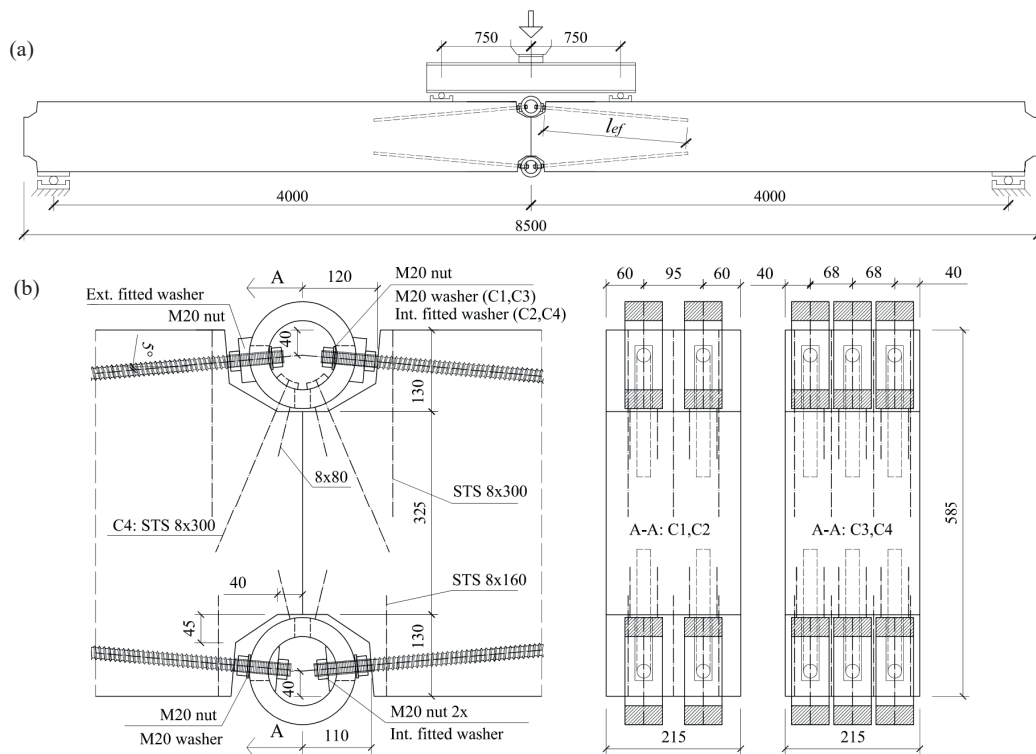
Experimental set-up: (a) the spliced beam, (b) technical specification of the joint. Measures given in mm.
